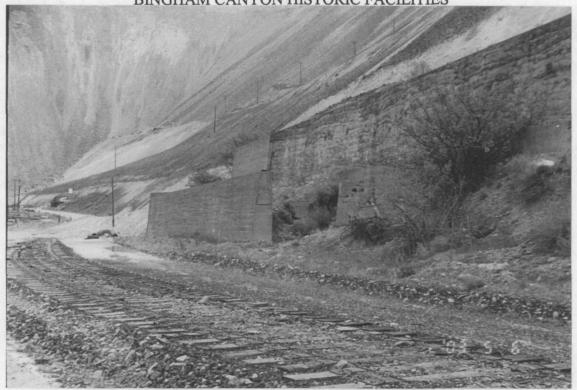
BINGHAM CREEK CHANNEL
